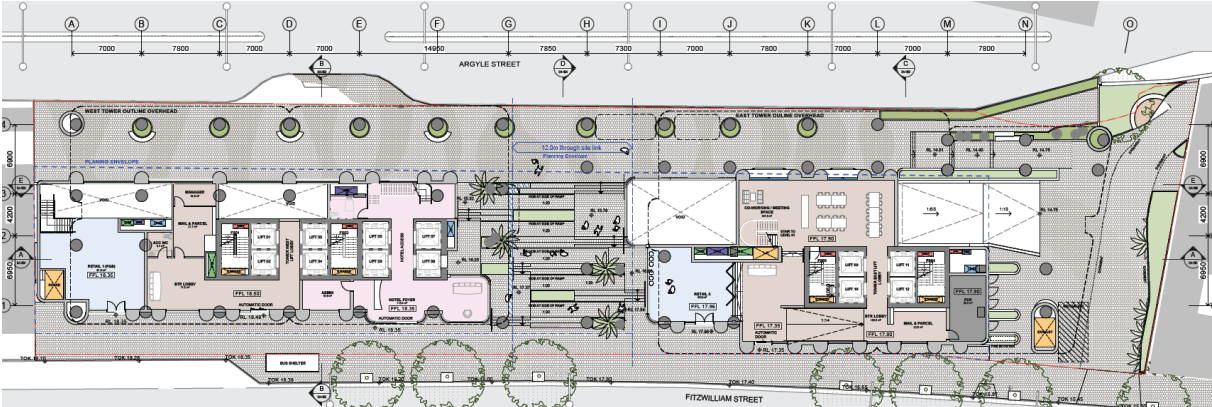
and Figure 3 show a render and ground floor plan of the proposal.
